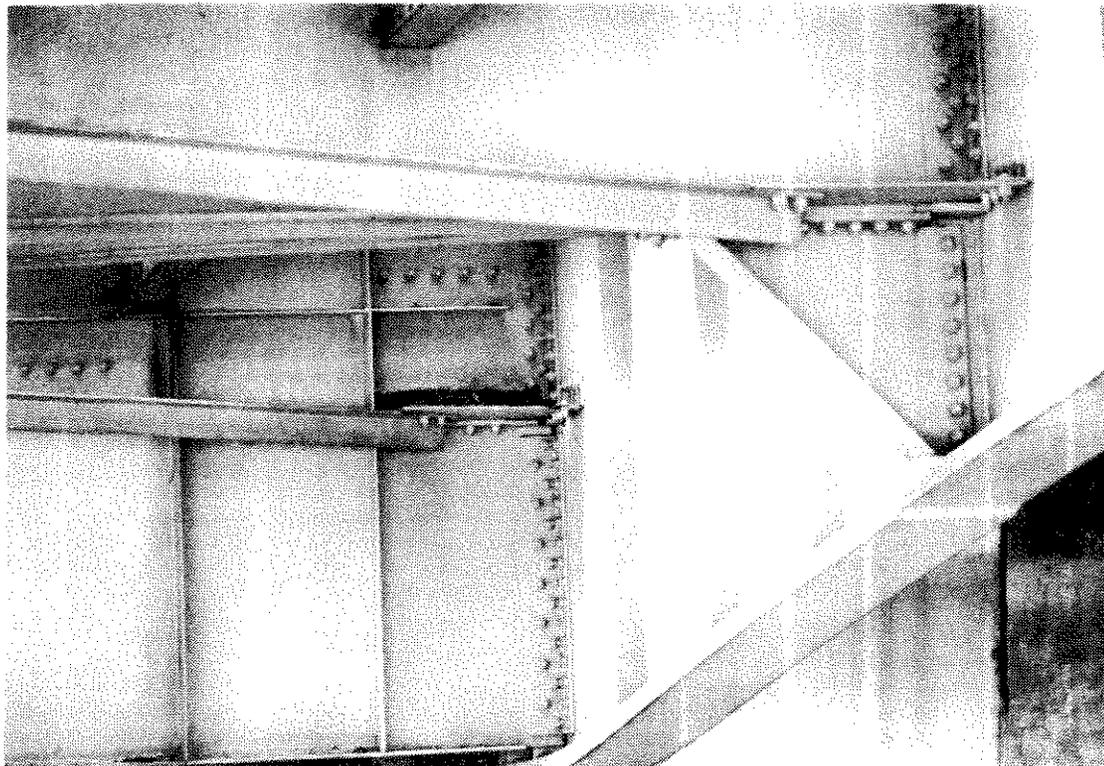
FRICTION CONNECTION OF FLOOR BEAM AND MAIN GIRDER
